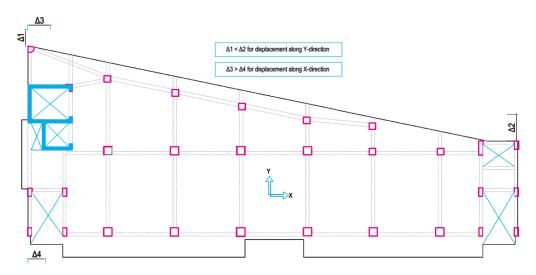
(a) Typical Floor Plan of a 12-storied Building
